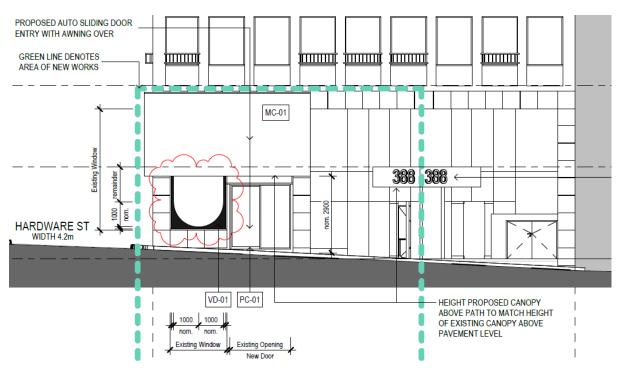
Proposed works at ground level along the Lonsdale Street frontage. From Drawing TP12
